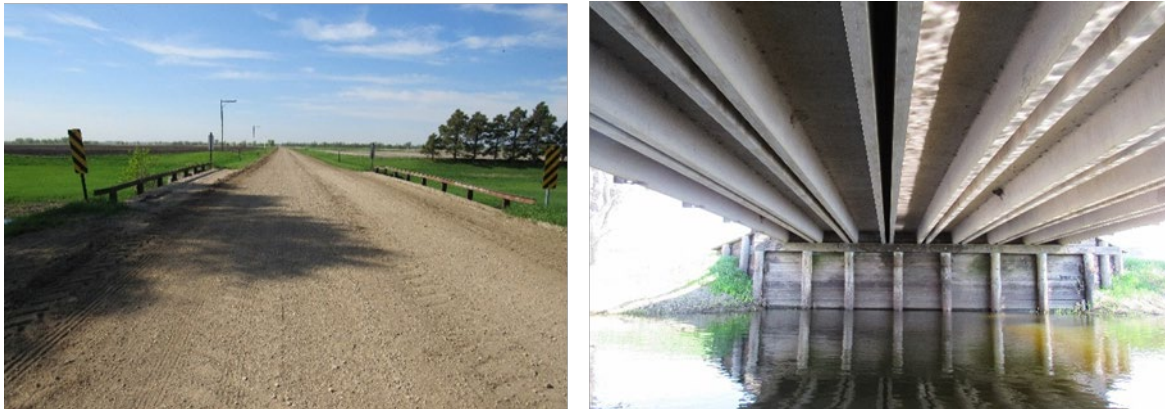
Description of Bridge B (Kidd et al. 2021): (a) view of the bridge from the road surface and (b) view from underneath the bridge.
